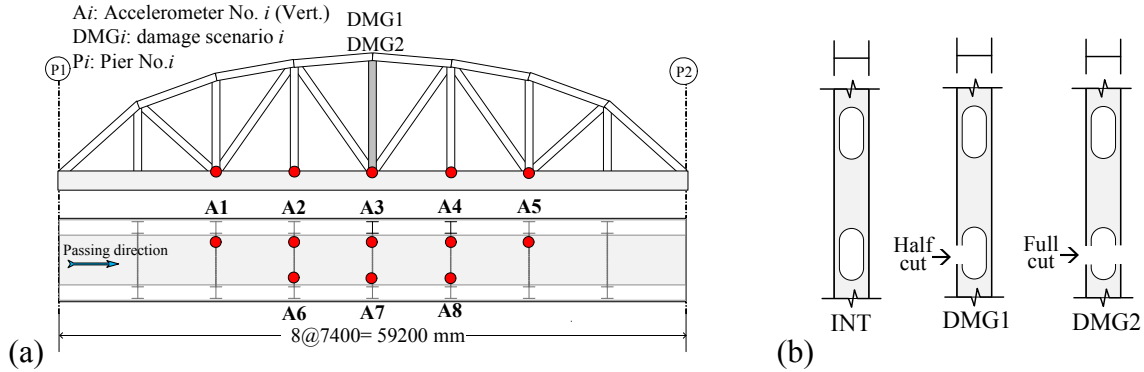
Sketch of (a) experiment bridge and sensor layout; (b) artificial damage.
